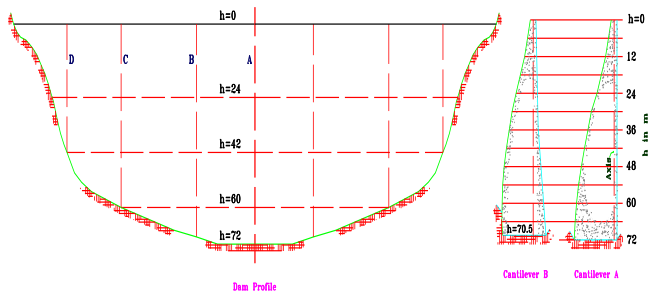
Dam profile and the sections of cantilevers 'A' and 'B'
